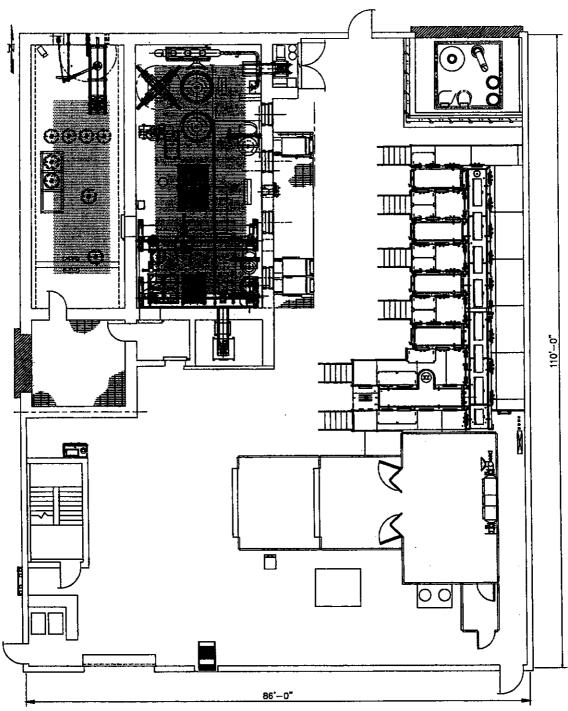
WPF Waste Process Building 2nd Floor.
